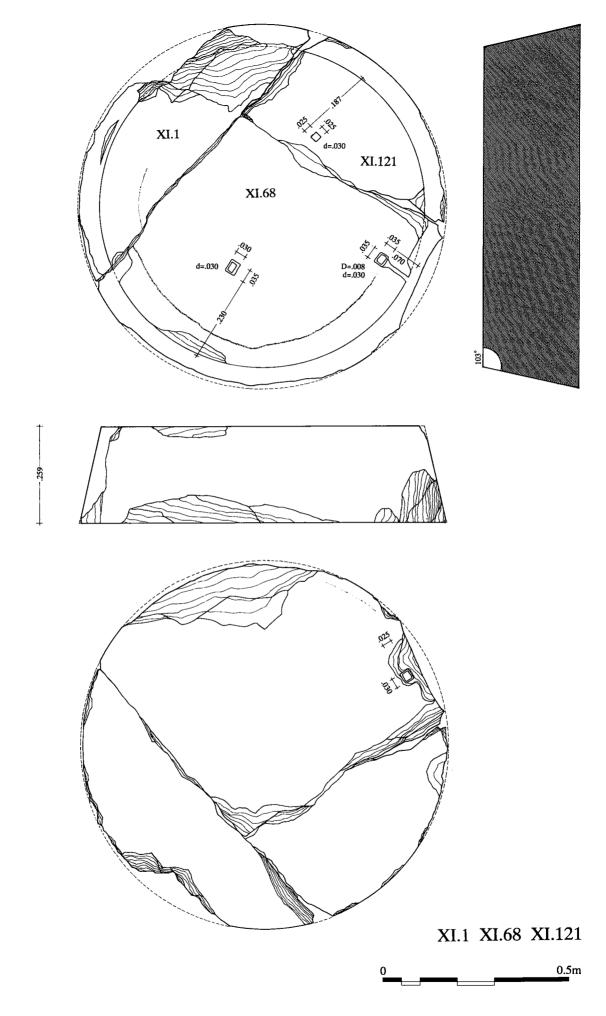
K3, Truncated roof block, XI.1, XI.68, XI.121
